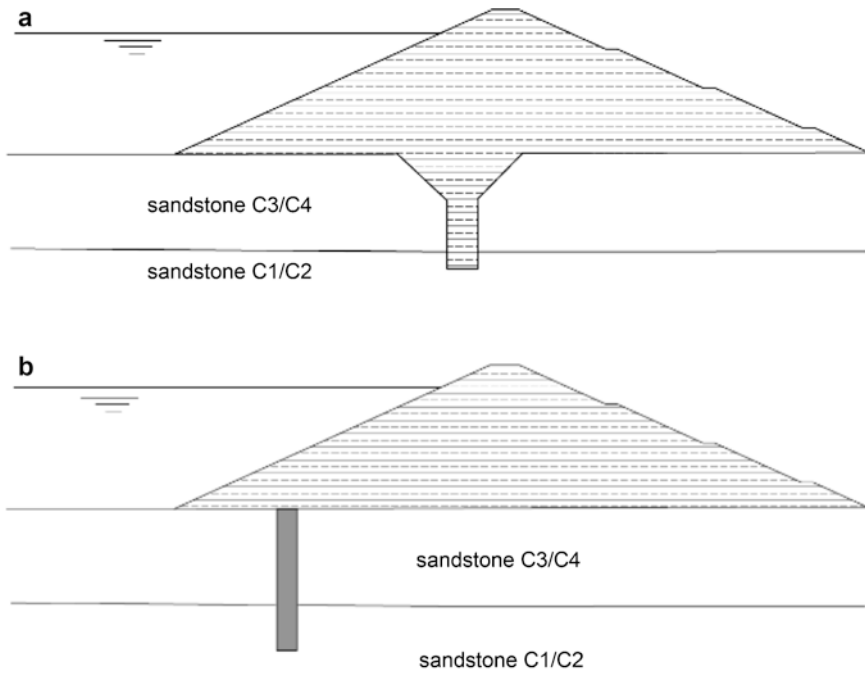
(a) Combination of partial trapezoidal and vertical trenches (Figure E.L. Pastore). (b) Jet grouting or plastic diaphragm wall (Figure E.L. Pastore)
